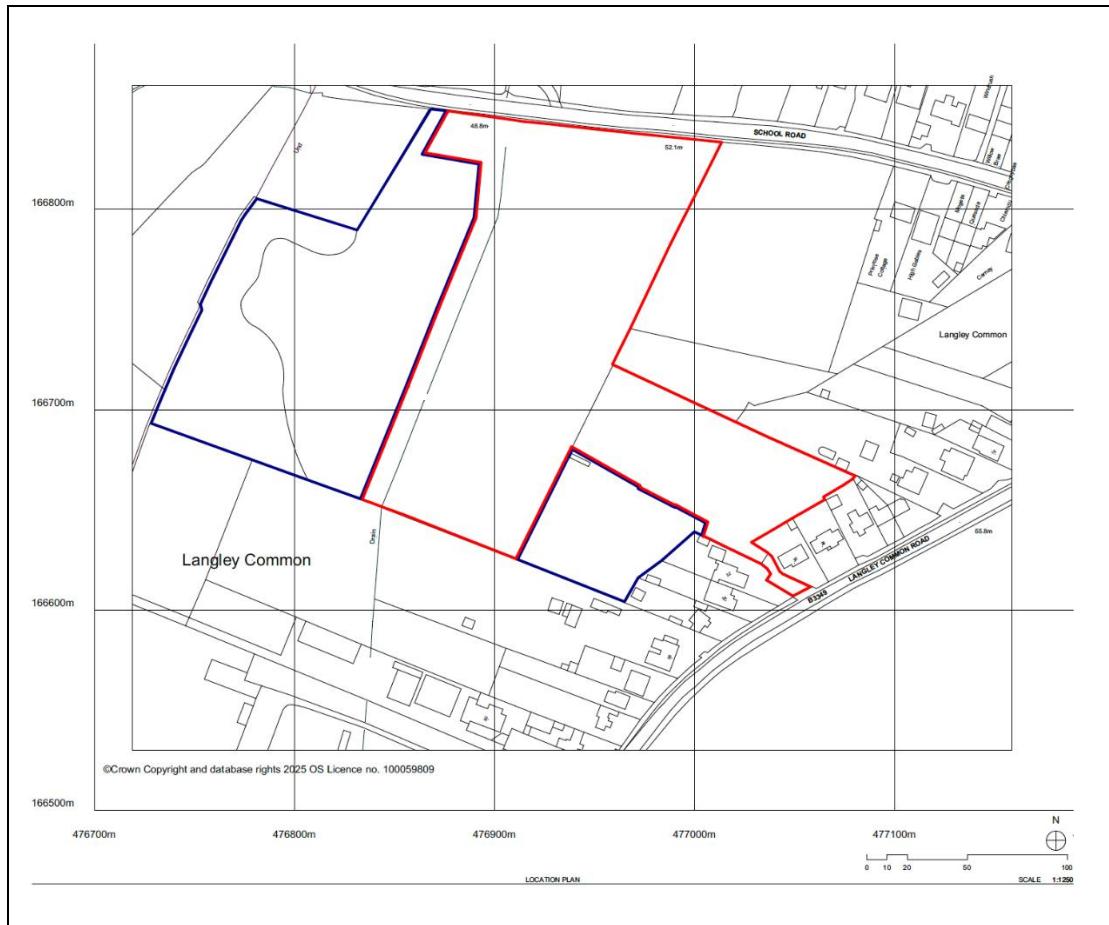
Site Location Plan (drawing ref: 2901 001P5)
